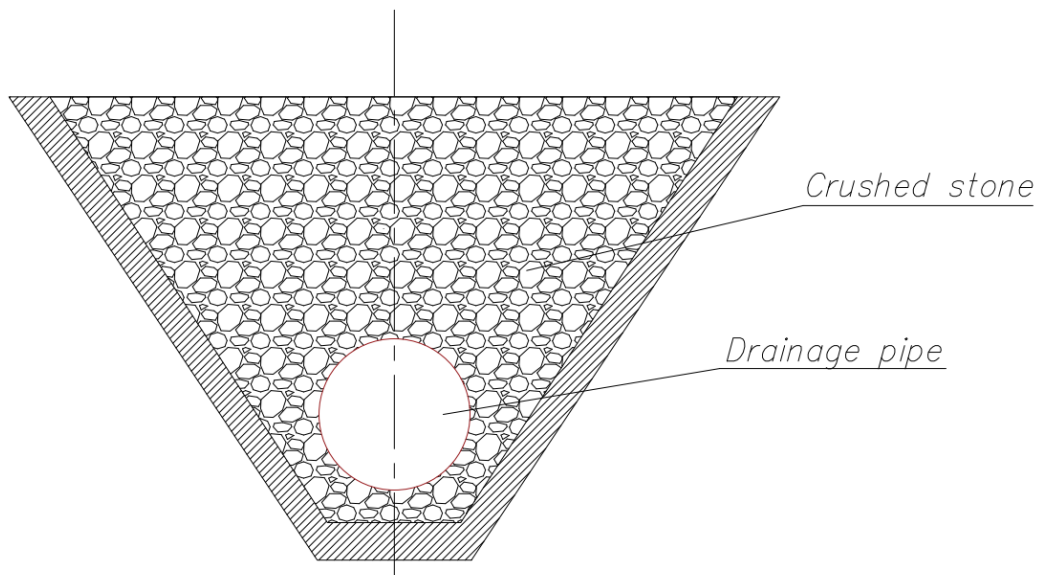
below shows a cross-section of a closed horizontal drain and its water-collecting culvert.
